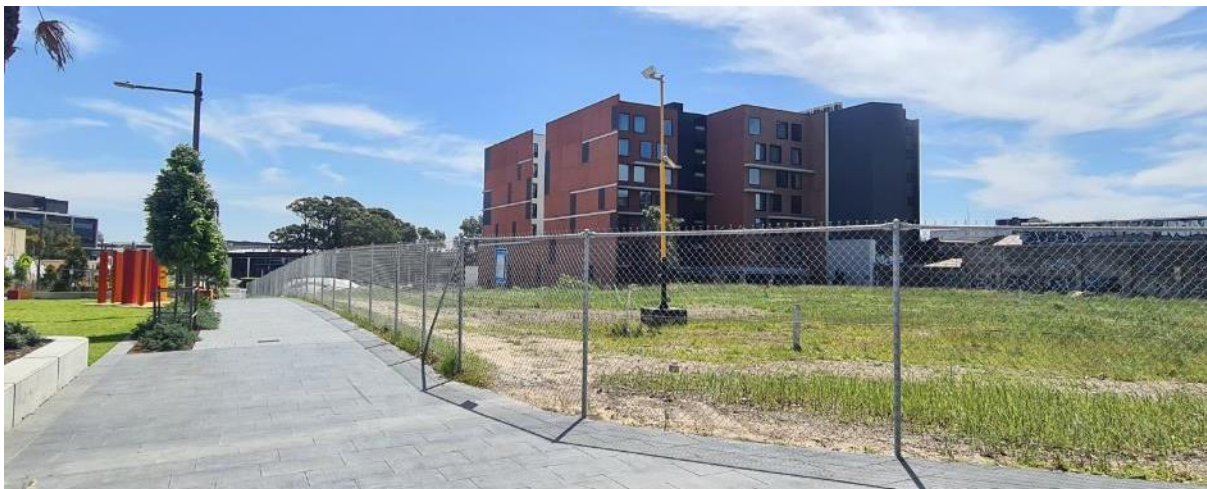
View looking west with the subject site fenced off, Ngamuru Avenue on the left and the Veriu Hotel at 18 O'Riordan Street in the background
